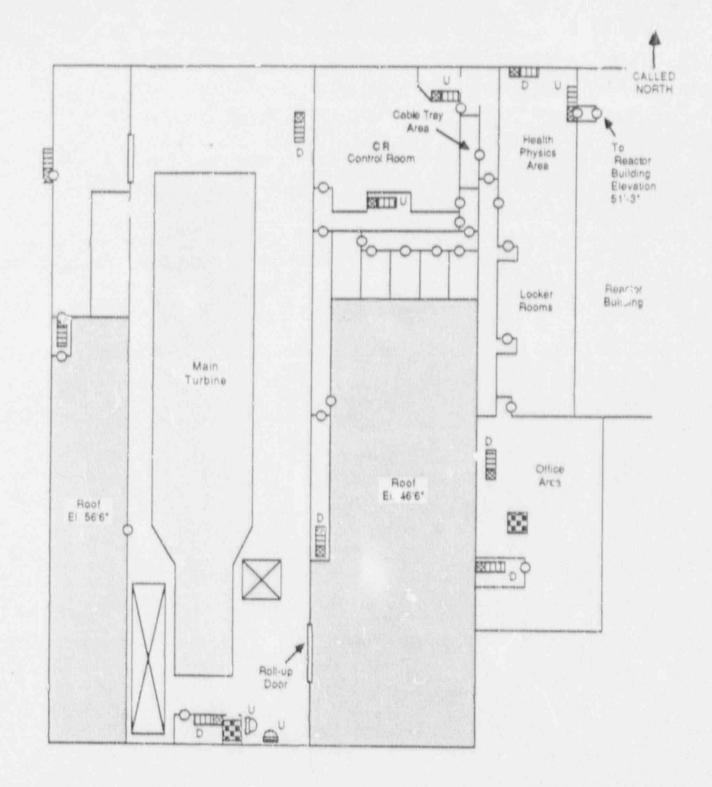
Oyster Creek Turbine and Office Buildings - Elevation 46'-6"
